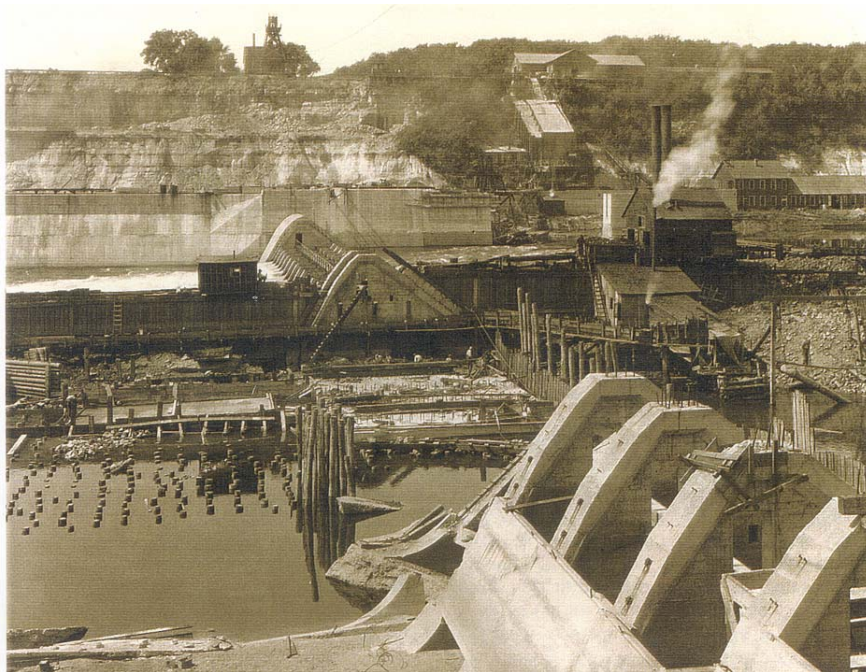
Lock and Dam No. 1 Under Construction - 1916
